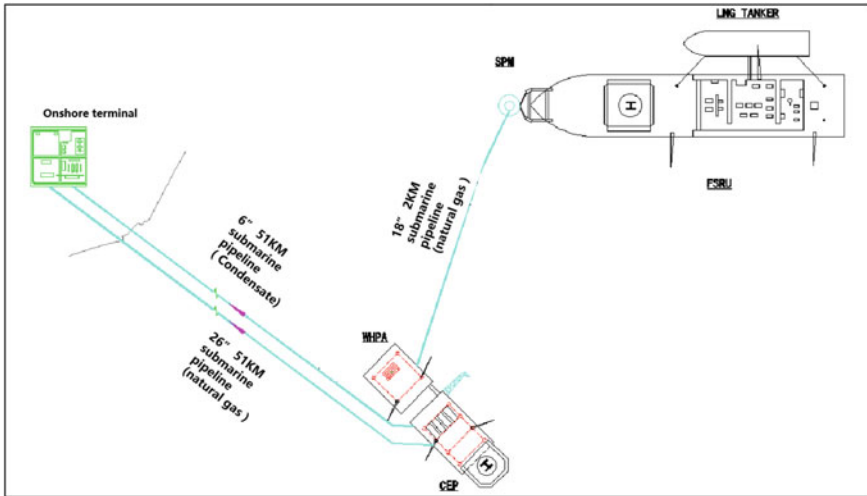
General plan layout of gas field (FSRU Plan)
